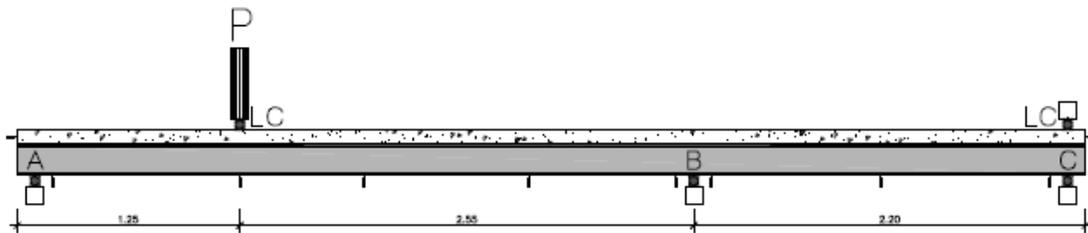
The load at the maximum positive moment of sections for the restrained steel-concrete composite beams.
